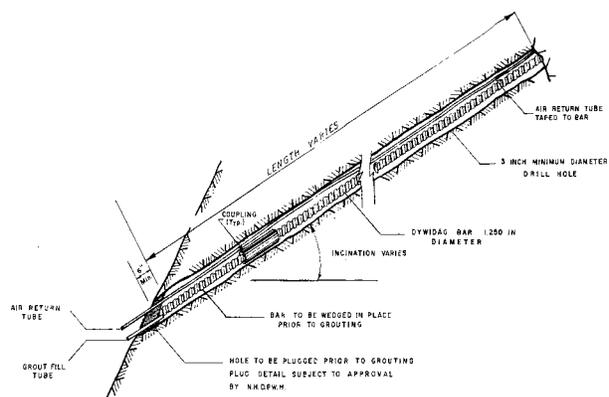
Detail of Rock Tendon (Haley and Aldrich, 1973)
